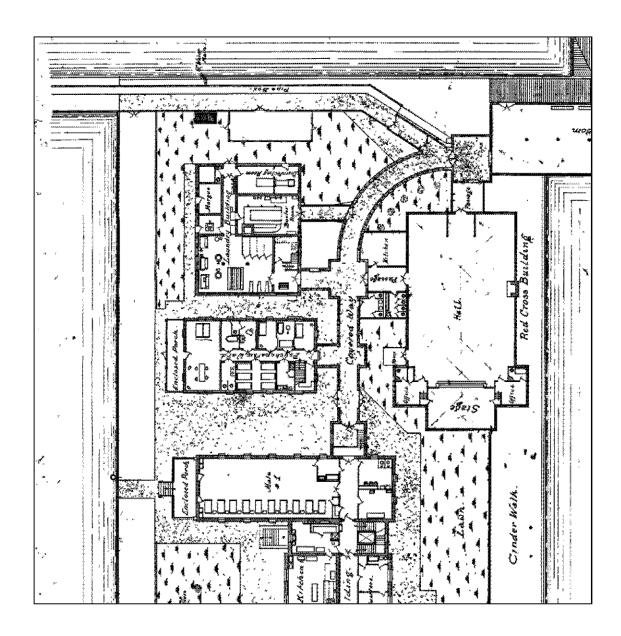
Excerpt from "Description Location Plan No. 2 Island," showing Hospital Outbuilding, (NPS Drawing No. 462/42,957, Sheet 1 of 3)
